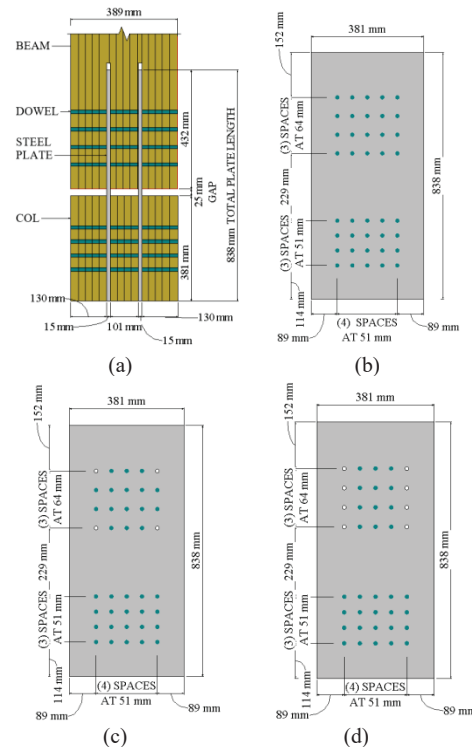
Connection: (a) section, (b) 20 dowels, (c) 16 dowels, (d) 12 dowels
